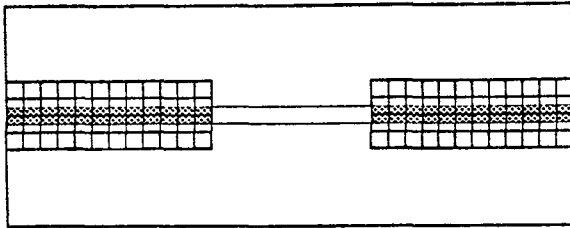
Additional WWF reinforcement in Specimens 2c and 2d.
